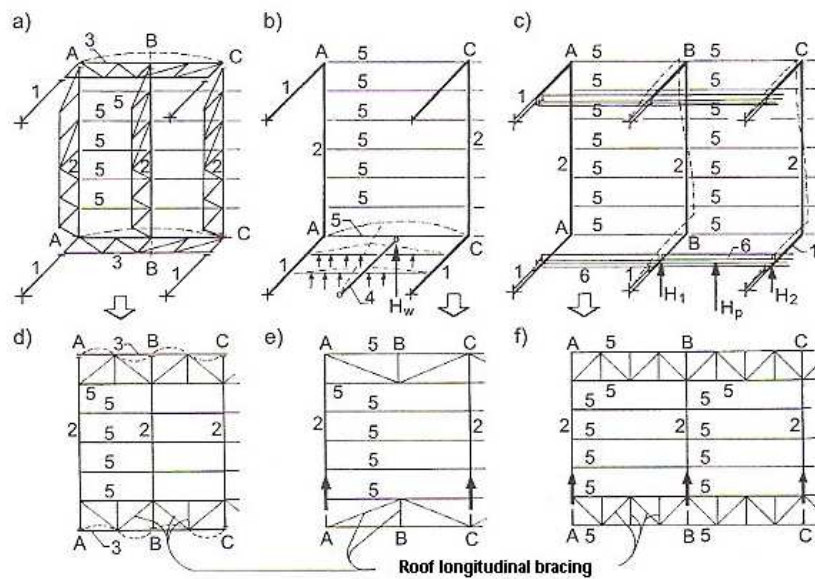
Possible deformations systems a),b),c): 1- primary column, 2- roof rafter, 3- main girder, 4- secondary column, 5- purlin, 6- crane runway beam, d),e),f): effect of longitudinal bracing
